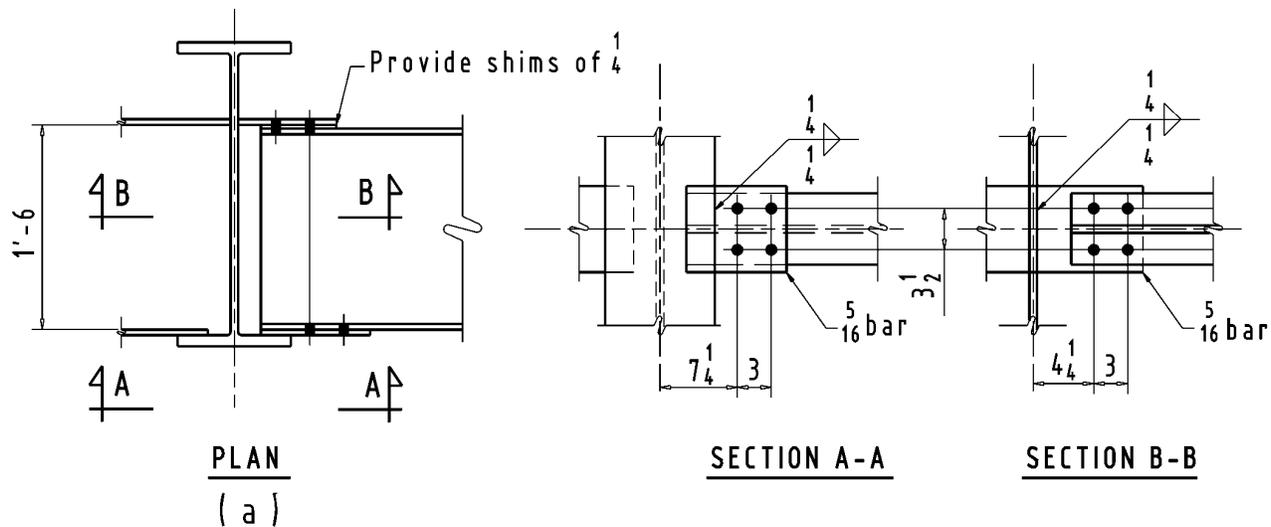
Details of the strut and bracing connections to the column shaft.
